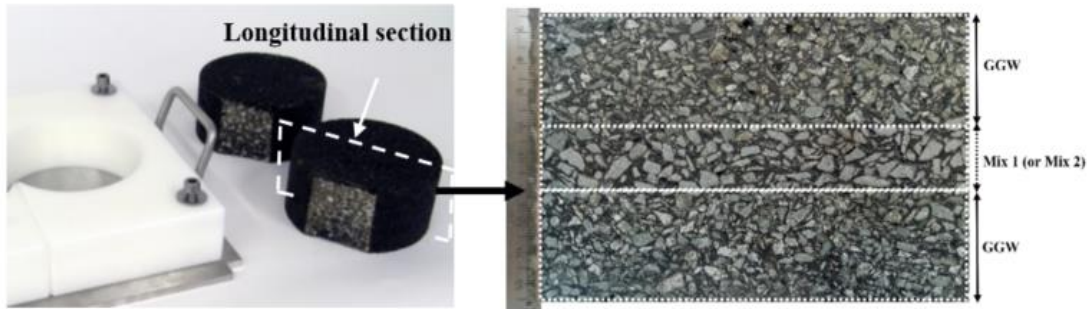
Longitudinal Section of HWT layered samples (GGW + Mix 1 & GGW + Mix 2)
